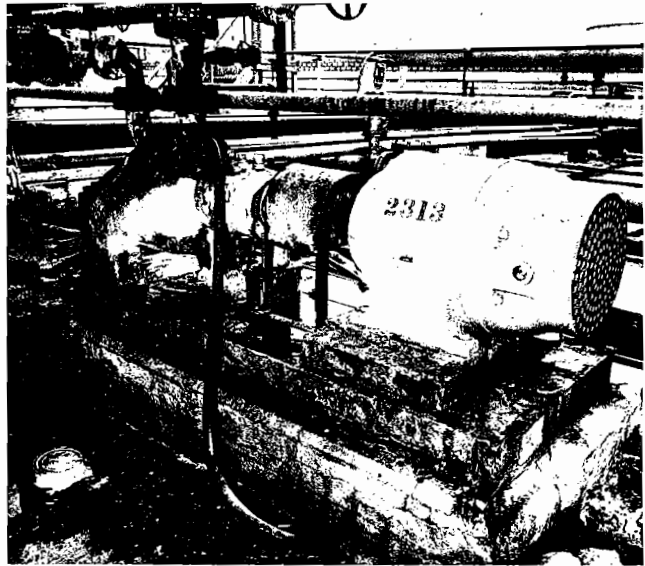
Pump with Severely Corroded Baseplate, and Cracked and Spalled Grout and Foundation.
